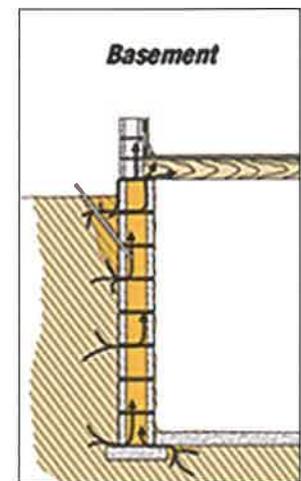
Basement foundation. Termiticide (shown in yellow) applied where termites enter and contact foundation elements.
